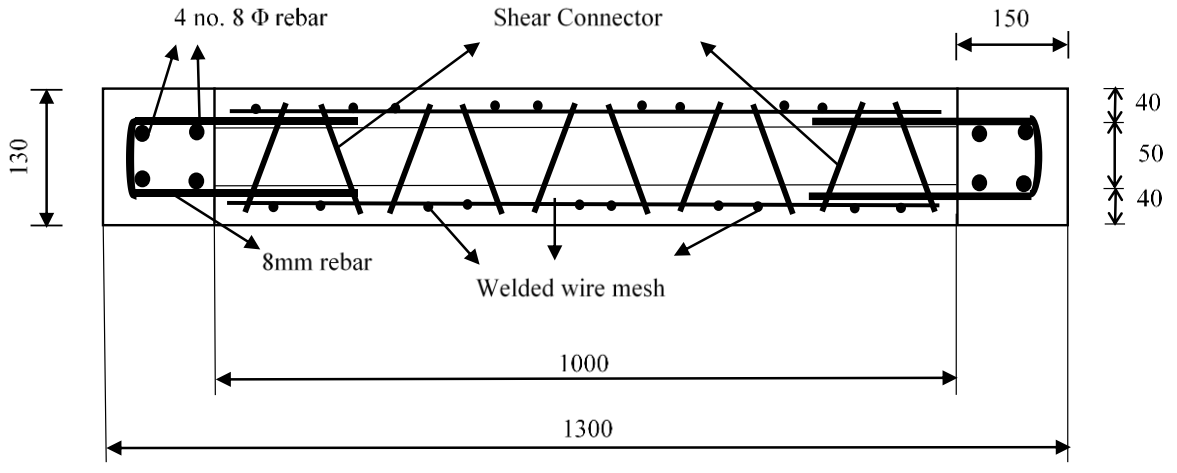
5: Cross section details of end beam (All dimensions are in mm)
